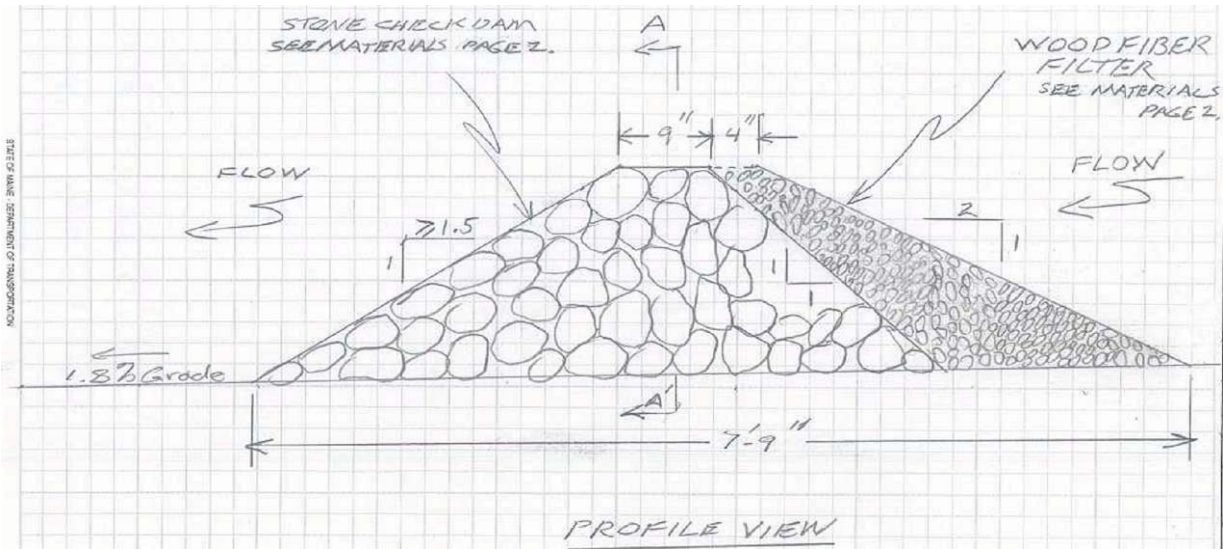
Design Cross-Section of MEDOT Filter Berm Tested at the UNHSC Field Facility; Wood fiber filter was used as core of berm, and stone rip rap as outer casing.
